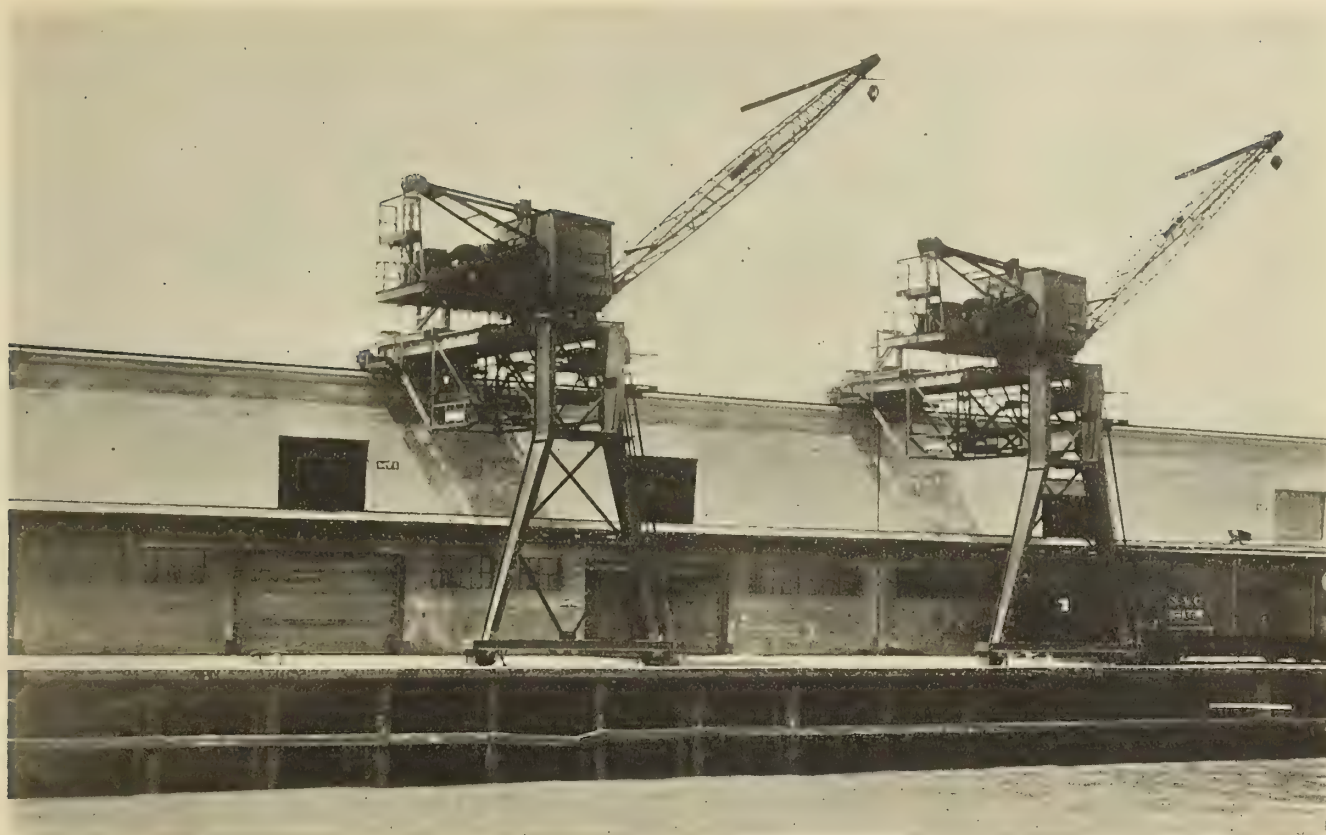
Side View of Pier, Showing Shed, Traveling Gantry Jib Cranes and Location of Railway Tracks Between Shed and Side of Pier
